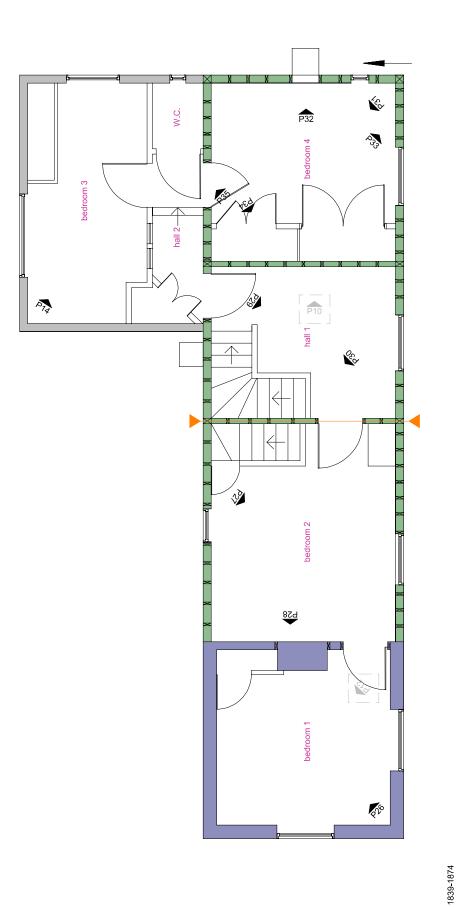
First floor plan. Location and direction of photographs reproduced in the text shown. Truss cross-section (Fig 8) location highlighted in orange.
